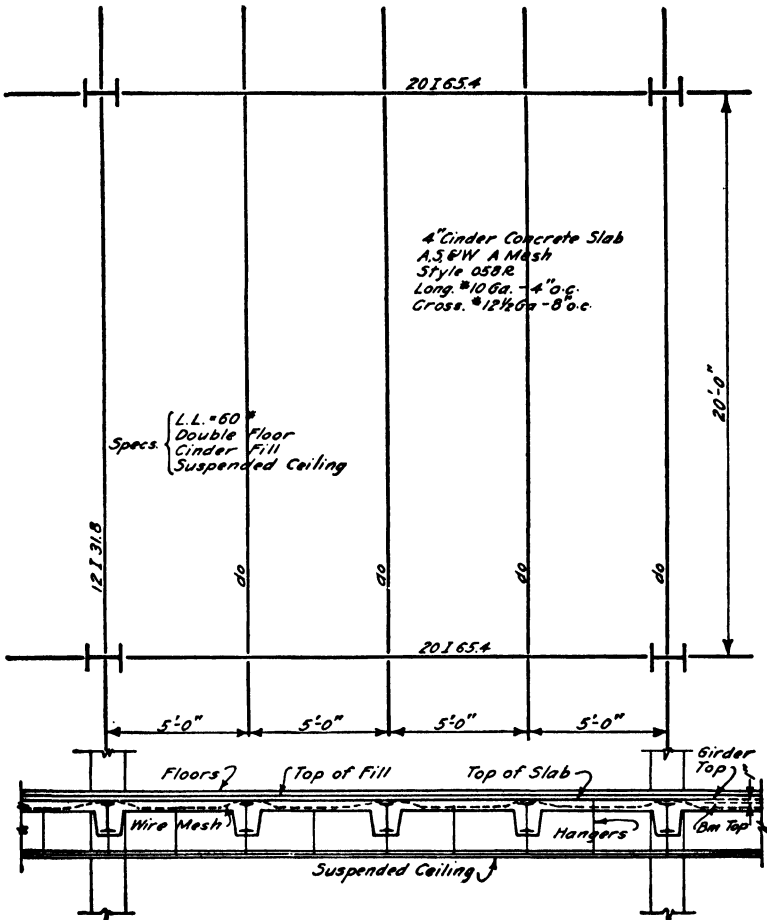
Framing for Cinder Concrete Slab in Steel Frame.
